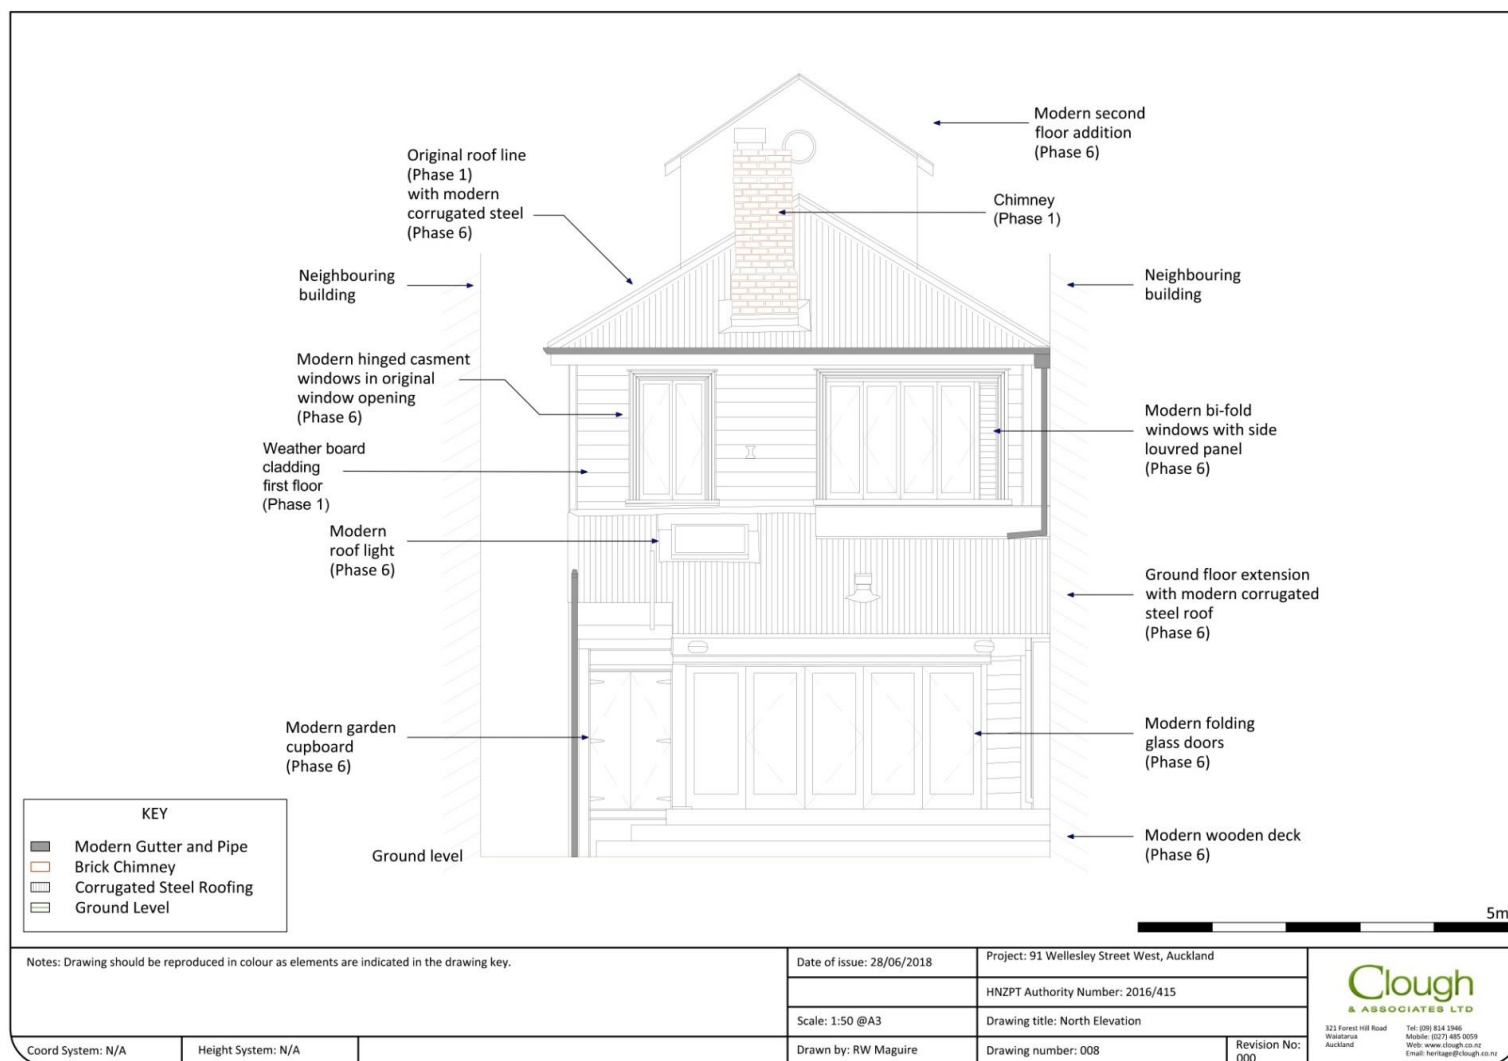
Rear (north facing) elevation of 91 Wellesley Street West (source: Clough & Associates 2015)
